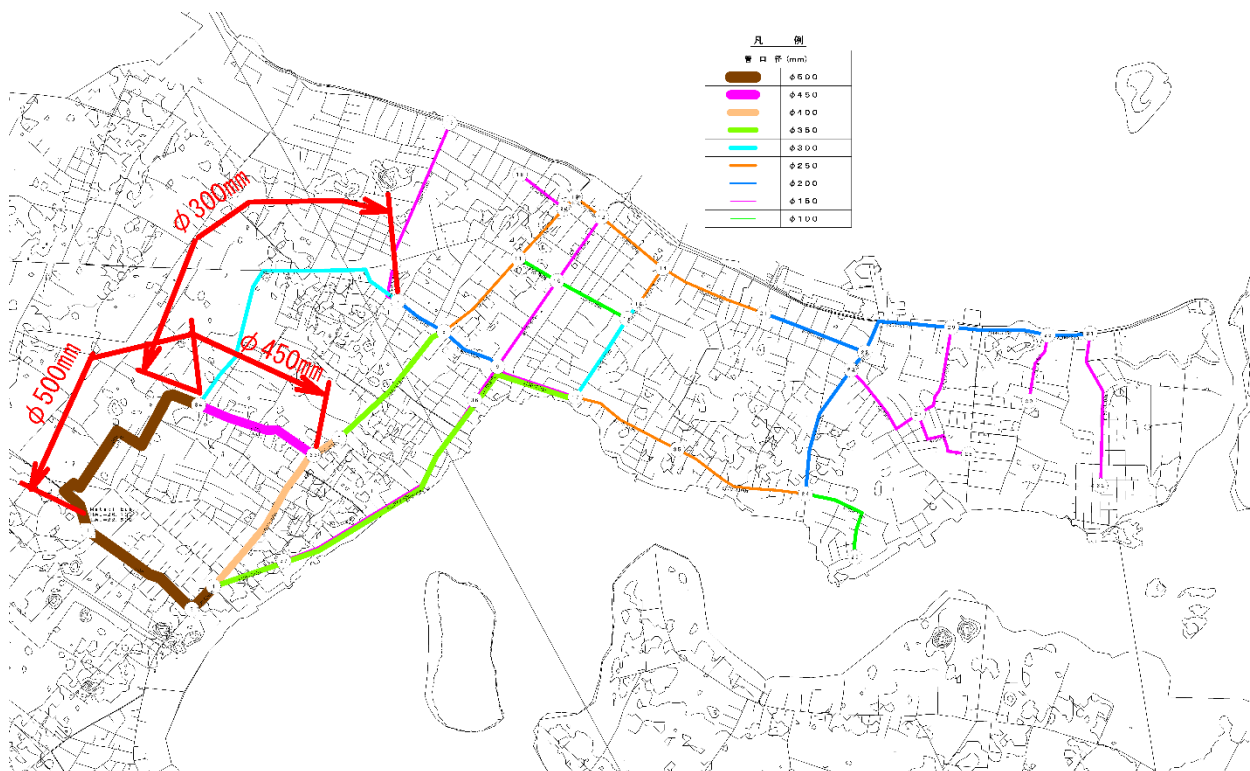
Proposed Improvement Plan by Bypass Connection Pipe
